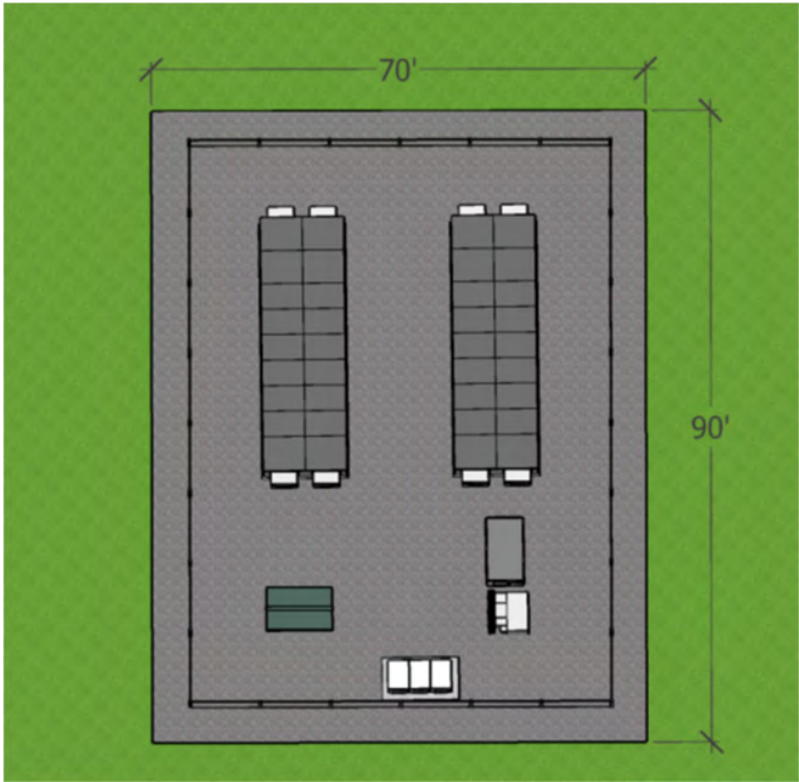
Westmoreland ESS physical layout and footprint dimensions
